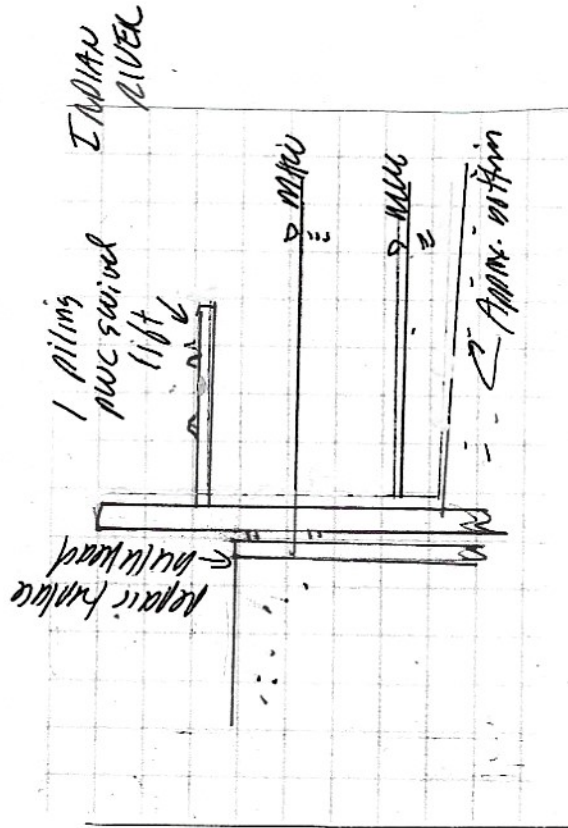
Cross-section sketches of proposed project. Sketches for permit application purposes only.
